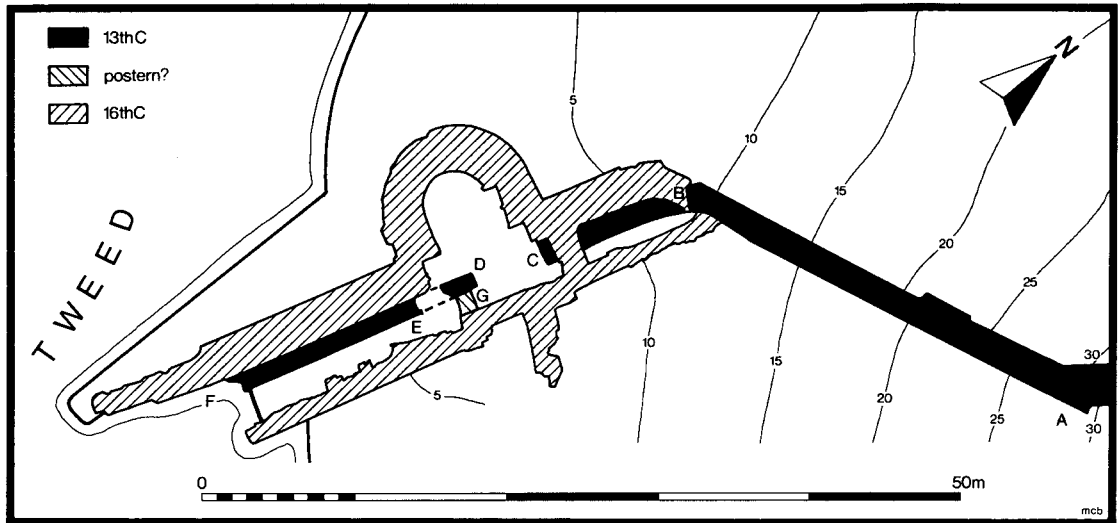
The White Wall and Water Tower, Berwick-upon-Tweed. Contour heights in metres.
